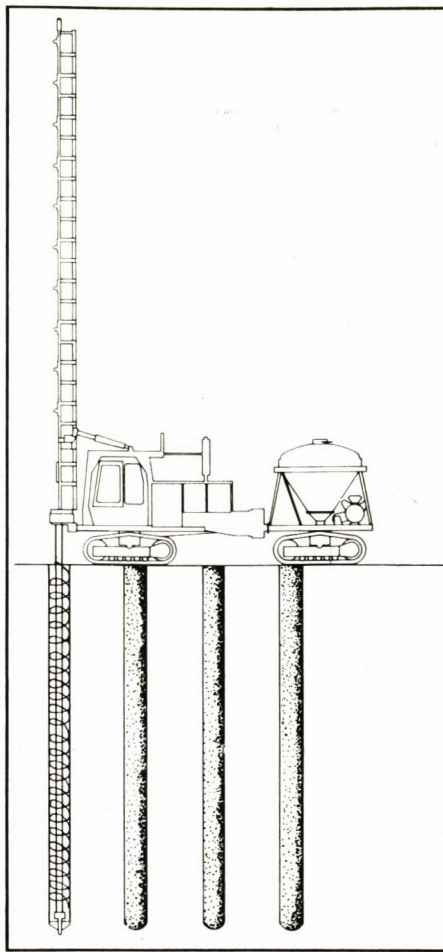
Lime columns are manufactured in-situ by mixing unslaked lime and clay. The LPS equipment consists of a mixing tool mounted on a special carrier, the unslaked lime being stored in a tank mounted on a trailer
